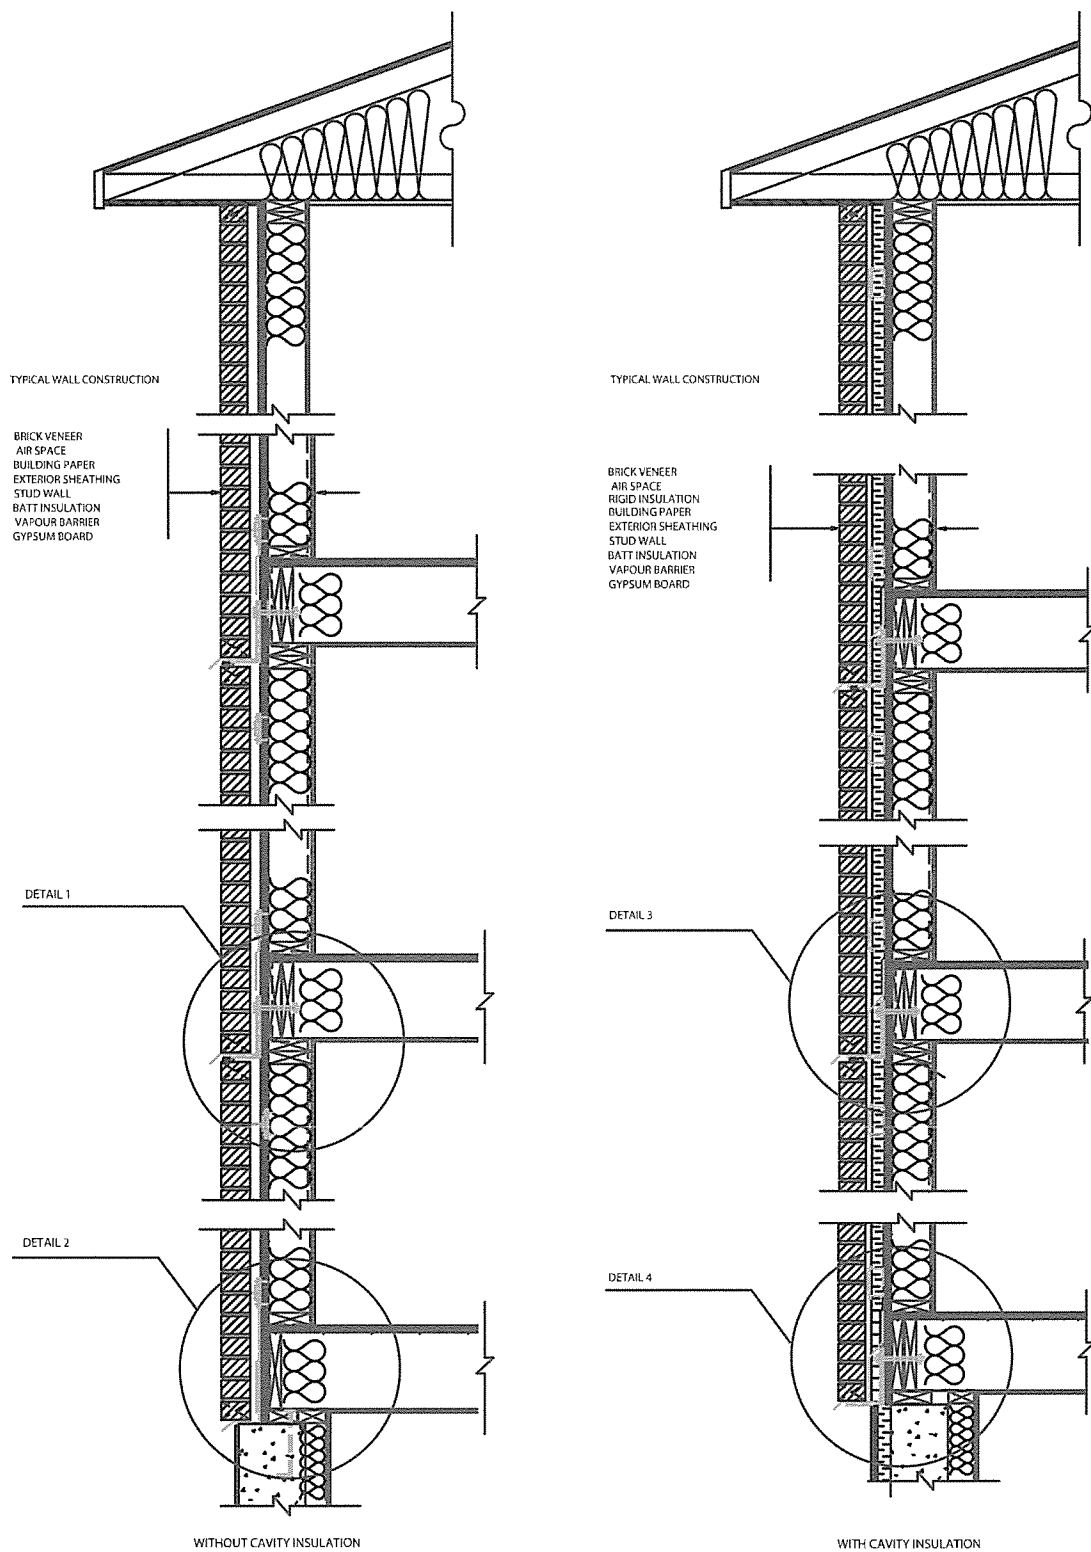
TYPICAL WOOD FRAME CONSTRUCTION APARTMENT BUILDING
